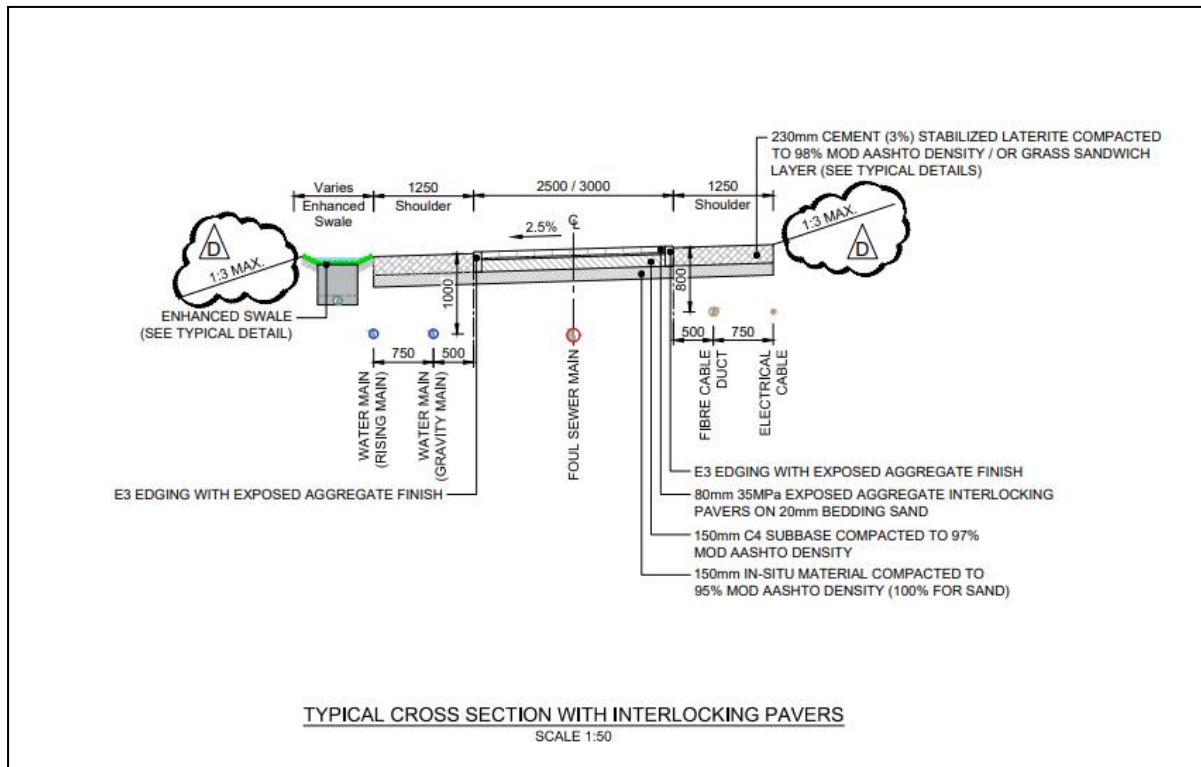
Typical Road Cross-Section with Interlocking Pavers
